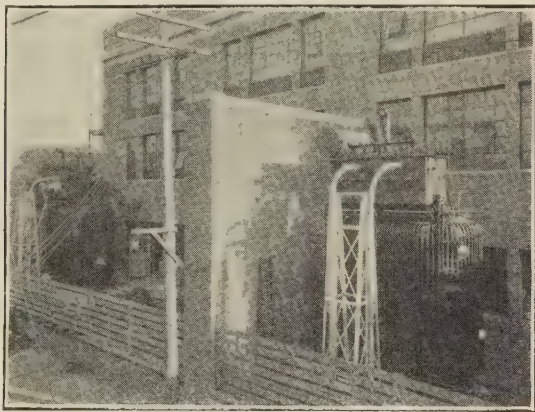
INSTALLATION OF POTHEAD TRANSFORMERS WHICH COMBINE THE CABLE POTHEAD WITH THE TOP OF THE TRANSFORMER
